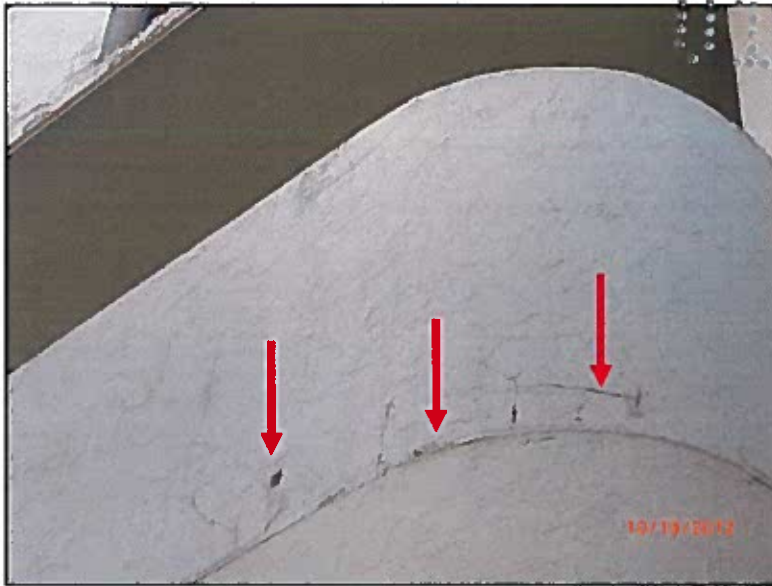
stucco cracking at bottom of third floor balcony wall on East side
